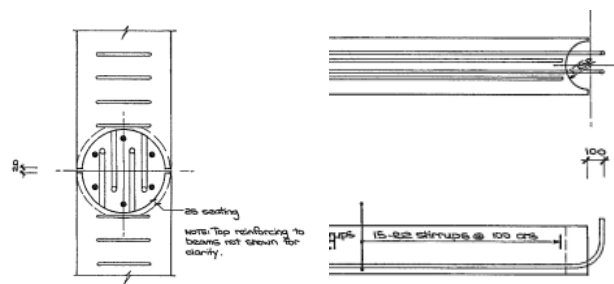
Typical bottom reinforcement anchorage in interior beam column joint zone [1]
